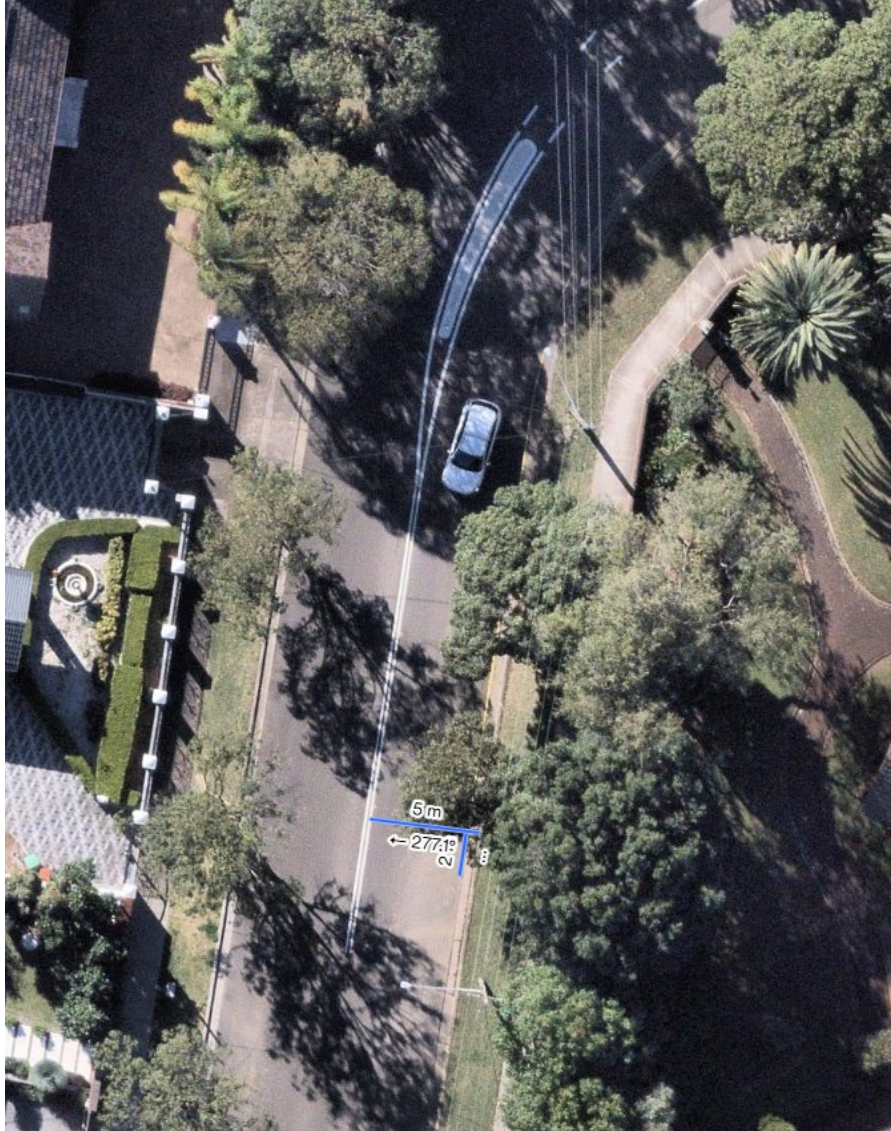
shortening of C3 on Chalmers Road south of Redmyre Road and resulting parking and travel lane widths
